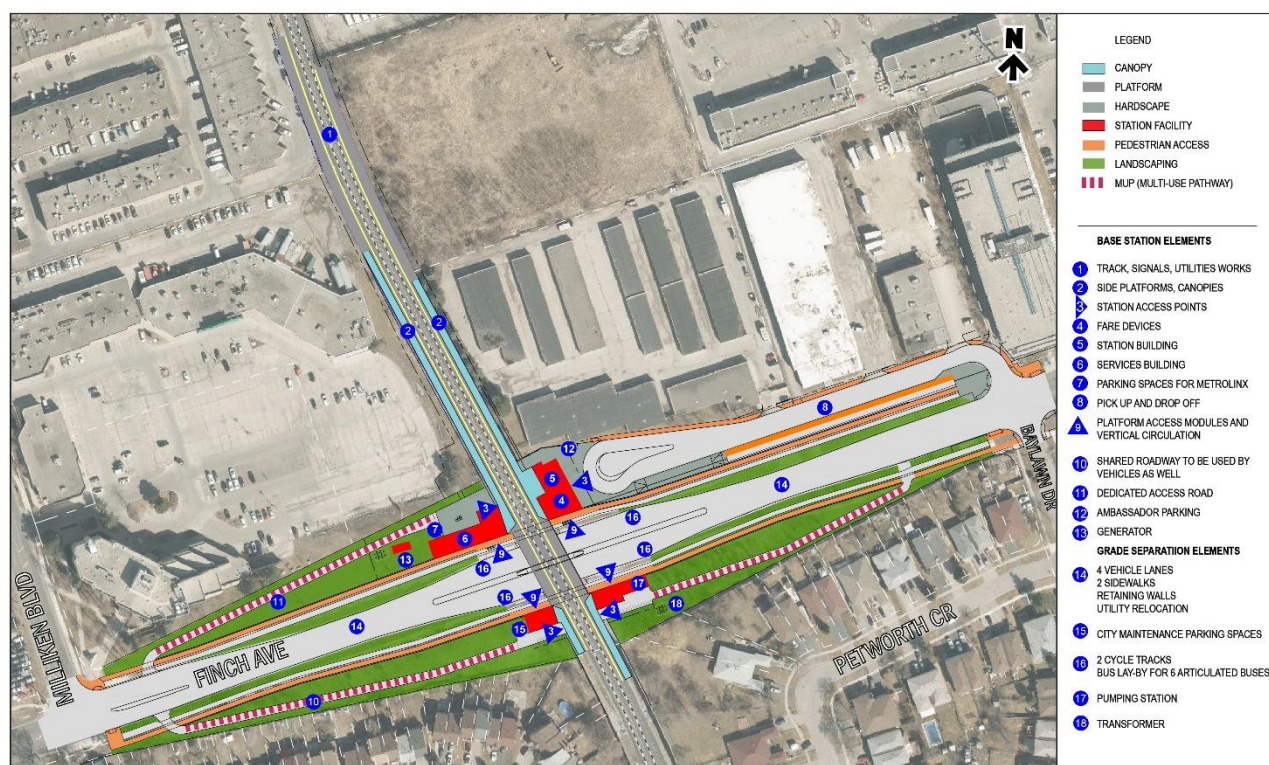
Conceptual plan of Finch-Kennedy Station. Source: City of Toronto (Based on site plan by Metrolinx, February 2023). Note: Station plan shown above is indicative and does not represent a final design.
